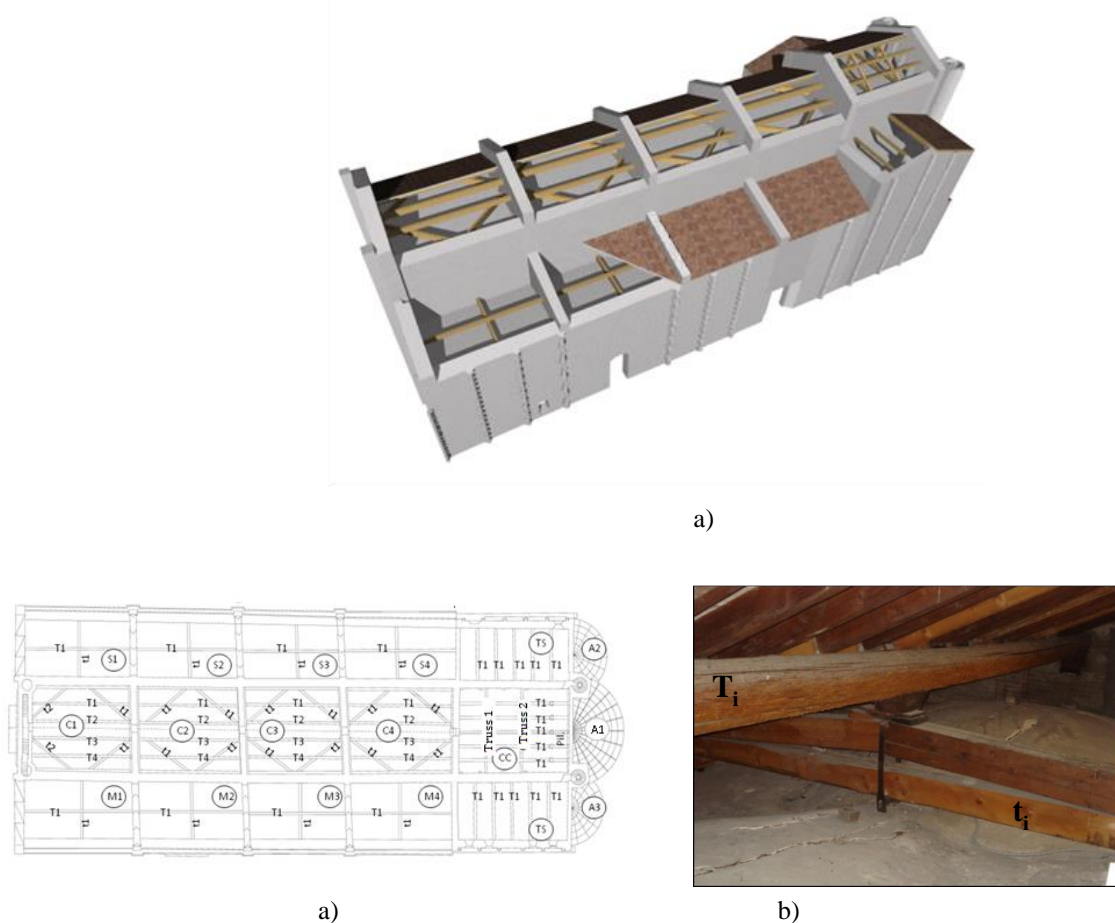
a) A 3D view of the roof system; b) Structural roof elements and c) Main beams (T_i) and trusses system (t_i)
